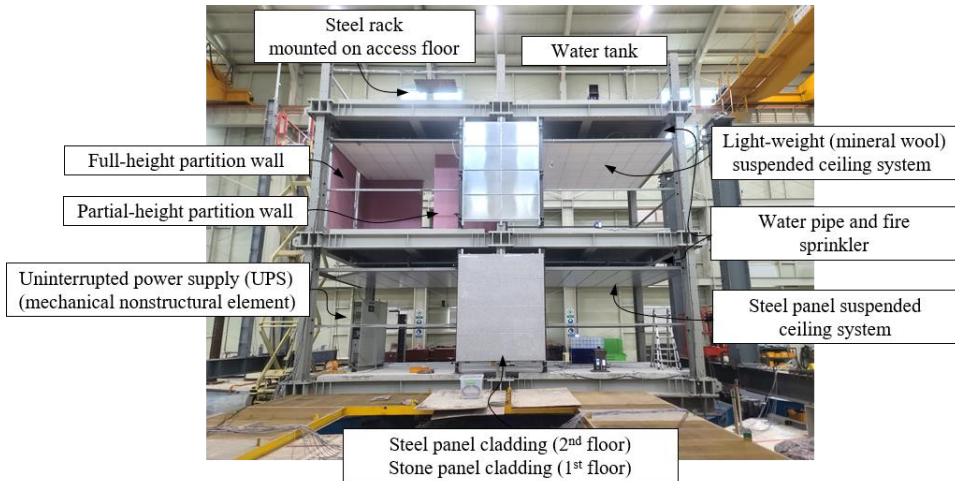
Overview of full-scale 2-story steel moment frame mounted on an array of two shake tables with various nonstructural elements.
